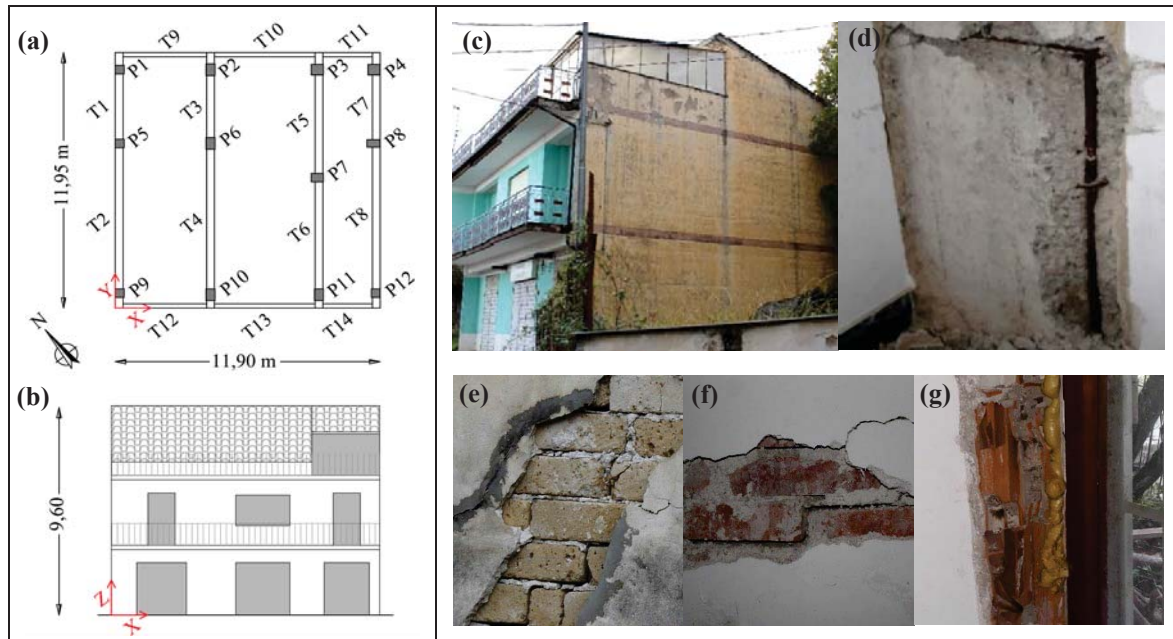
Schematic geometrical plan (a) and front view of the S-W façade (b). In situ survey (December 2020): external picture (c); vertical smooth bars found at the column base (d); infills details – tuff (e); solid clay bricks (f); hollow clay bricks (g).
